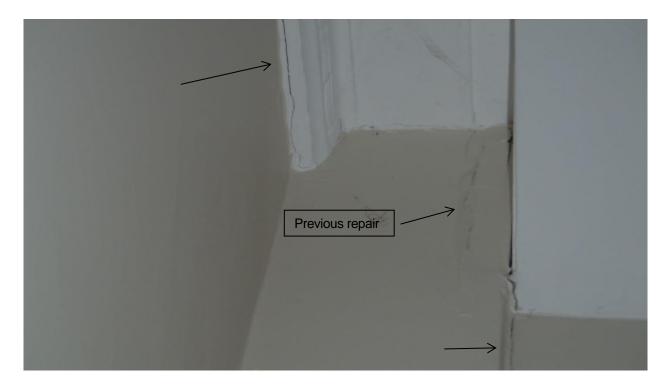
shows crack to the mitre joint of the cornice in the south western corner of the Kitchen and separation between the wall and moulding trim.
